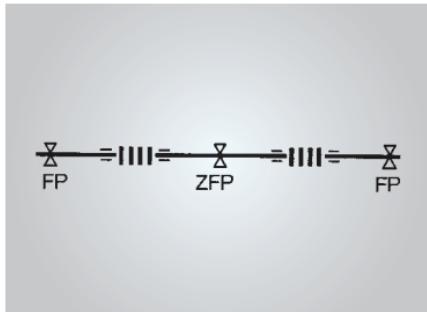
Straight pipe run, subdivided into two compensated sections by intermediate anchor
